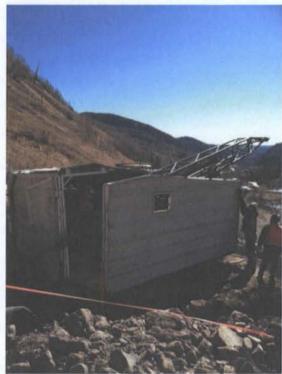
Drilling set-up at Drill Hole BAH-01; note sub-horizontal orientation of drill pipe
